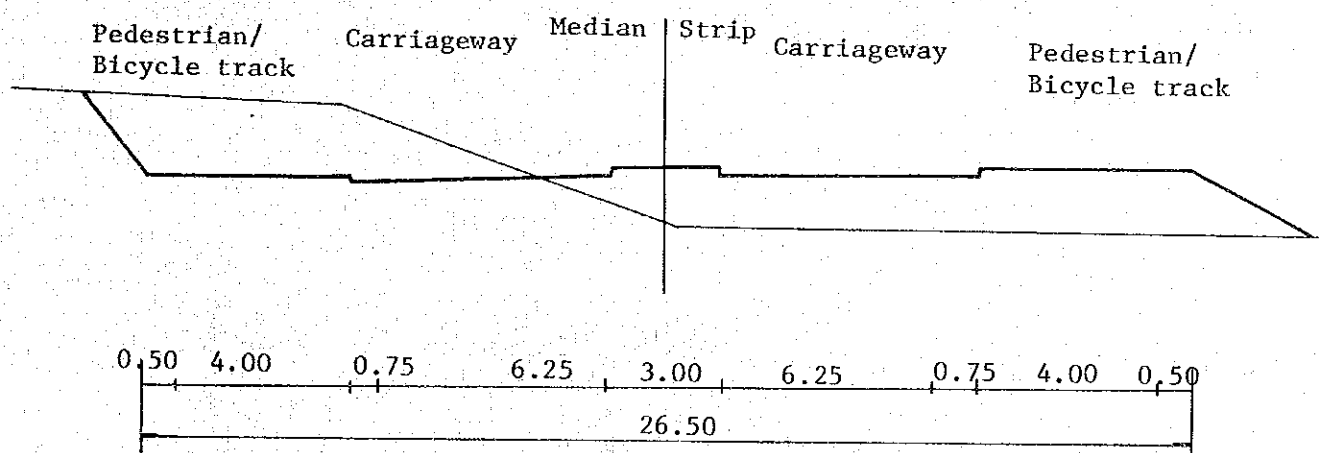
Typical Roadway Cross Section (unit:meter)
